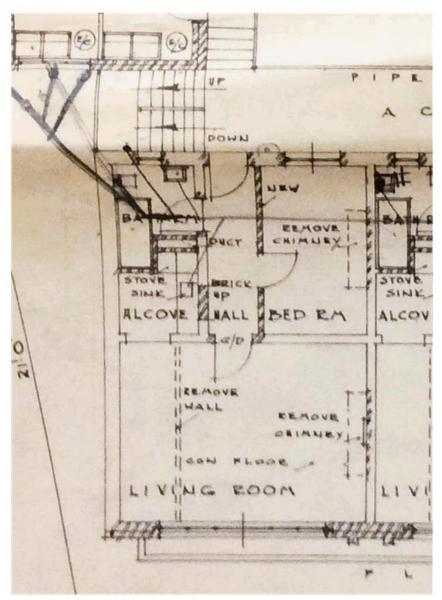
Typical plan of converted basement space to form the ground floor flats.
